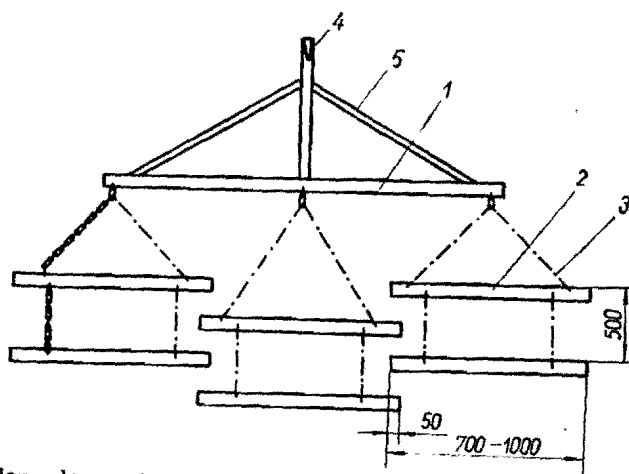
Wooden drag: 1—hitchbar; 2—working beam; 3—chains connecting beams; 4—hitch hook; 5—angle struts.
